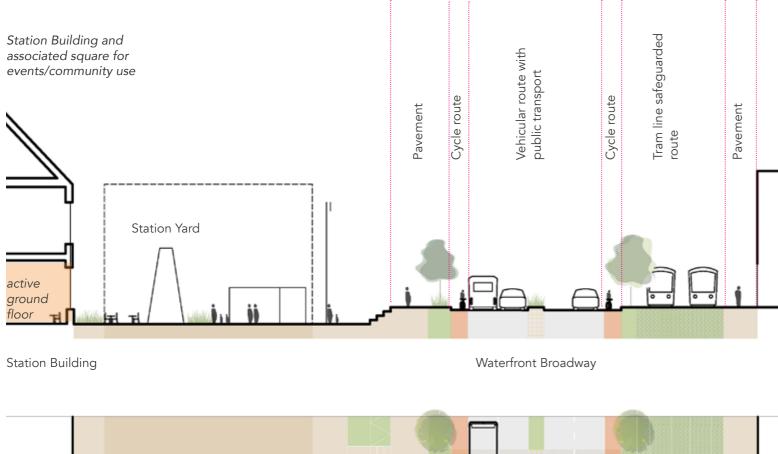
Illustrative section and plan for Waterfront Broadway
